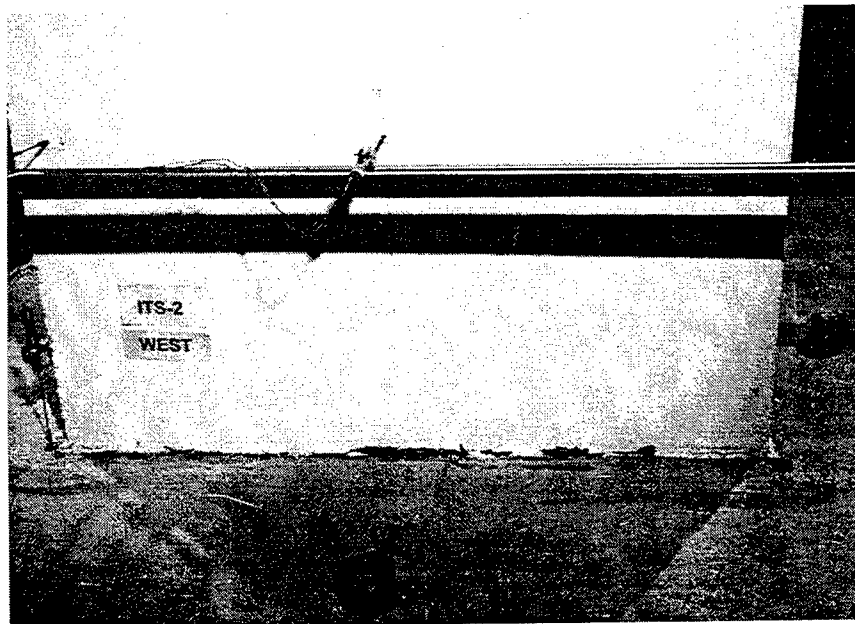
ITS-2 view of west wall, imposed top deflection of 2 in. towards the east.
